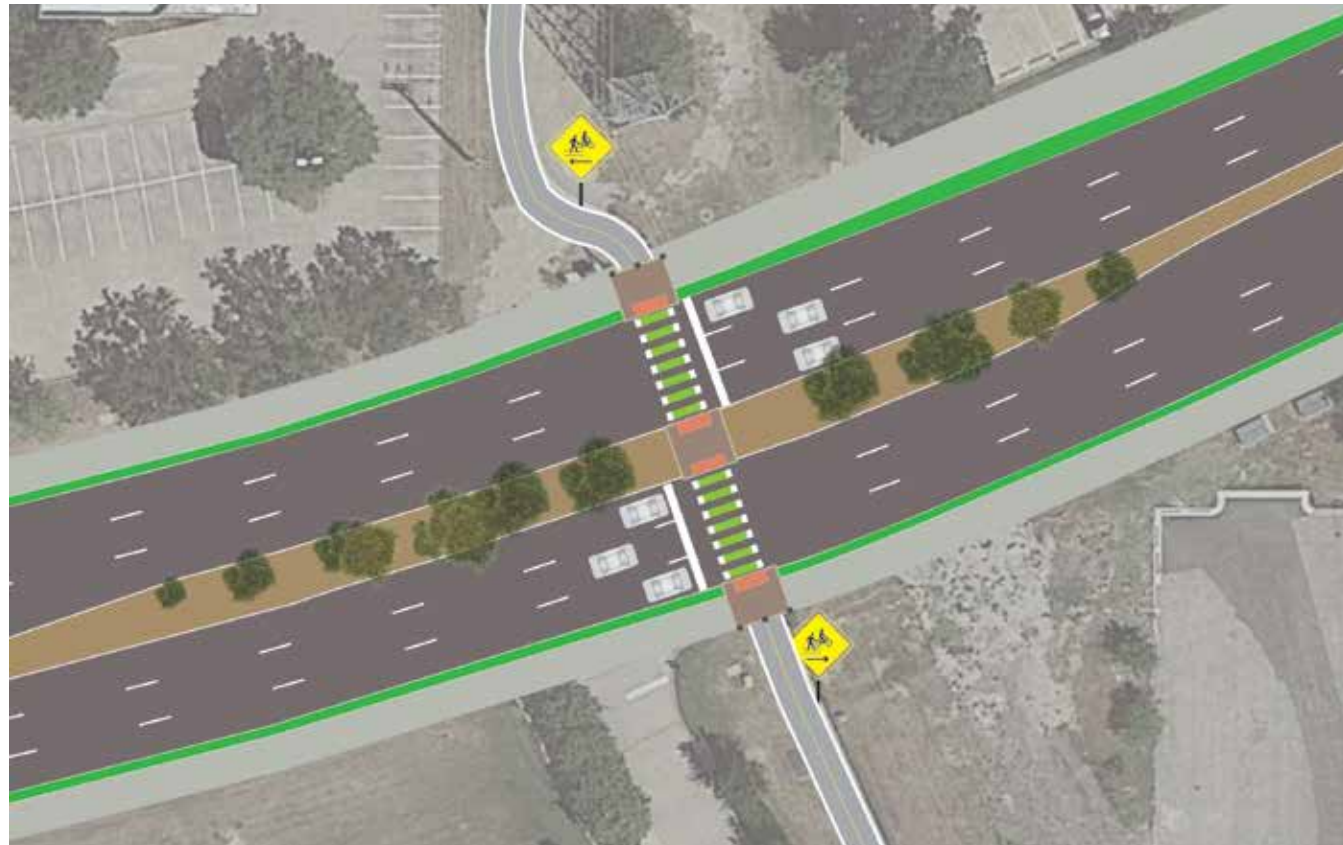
Prototypical Arterial Street Mid-Block Crossing (Belt Line Road)
